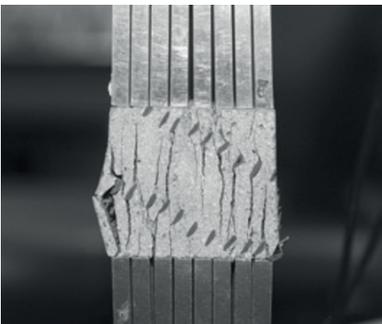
Crack pattern of a TRC cube with inclined reinforcement layers
